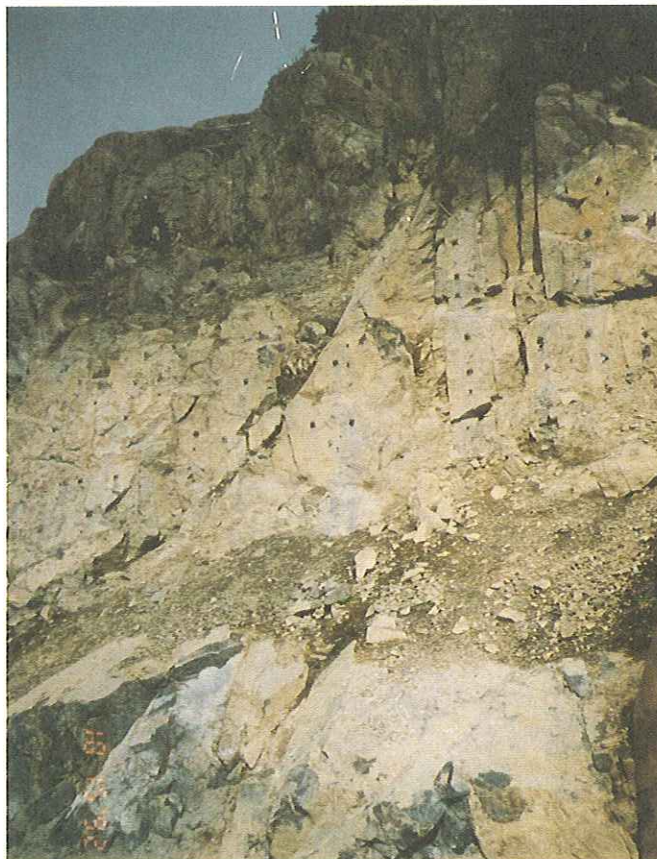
Steep blocks stabilized with 20 to 30-foot-long (6 to 9 meter) Dywidag rock bolts (Courtesy Washington Department of Transportation).
